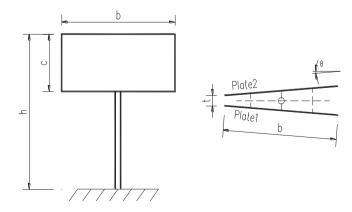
Elevation and plan view of a two-plate billboard structure model.
